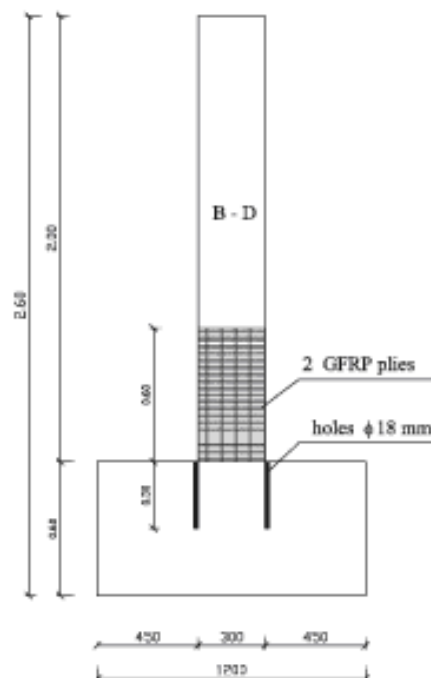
Cross-section parallel to sides B and D: final strengthening configuration
